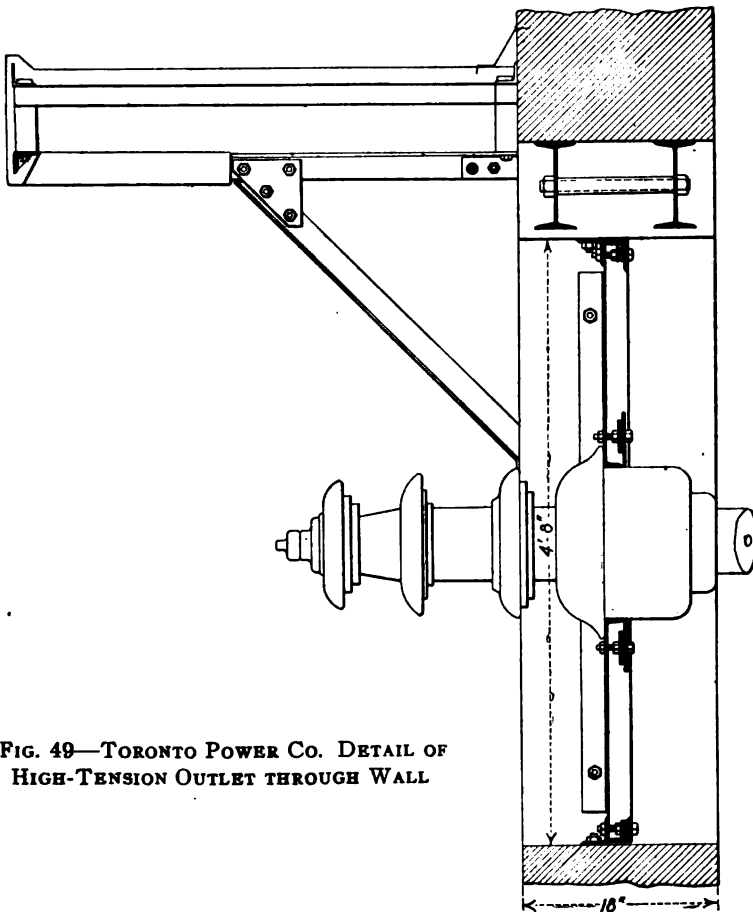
TORONTO POWER CO. DETAIL OF HIGH-TENSION OUTLET THROUGH WALL
